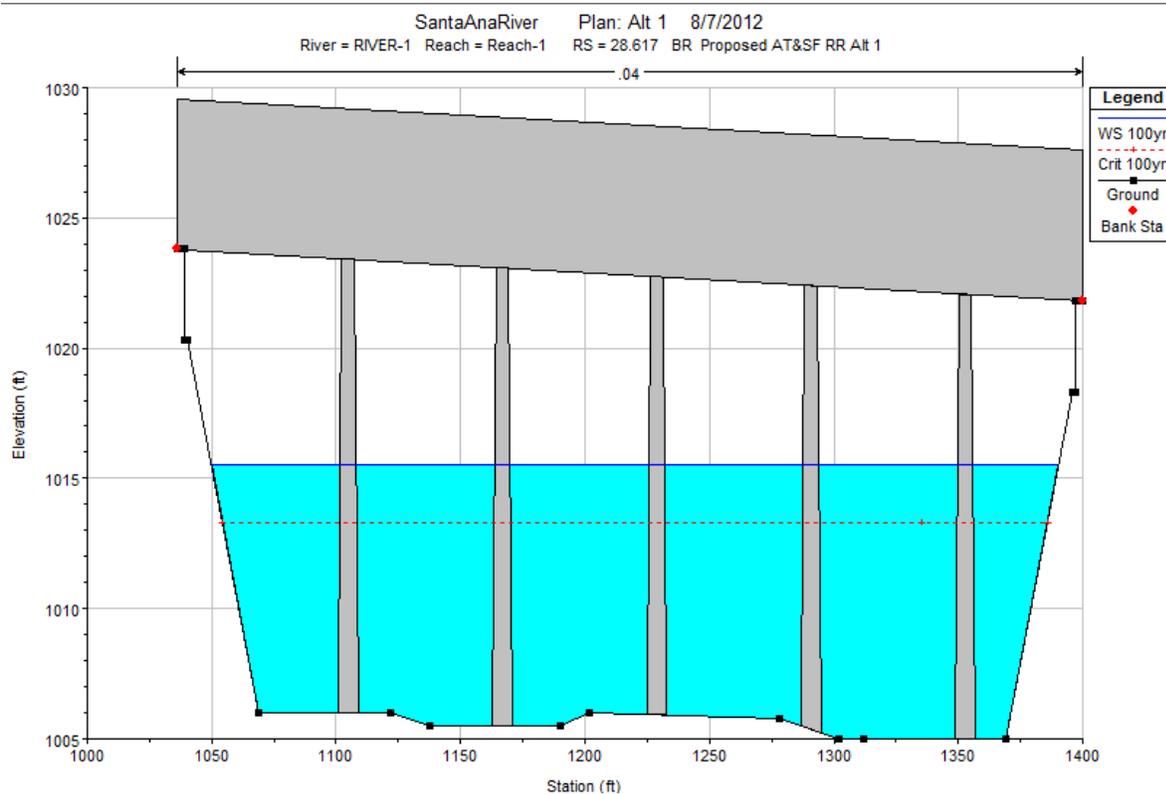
Cross-Section of Proposed Conditions Upstream Face of Bridge 3.4 (Alt 1)
